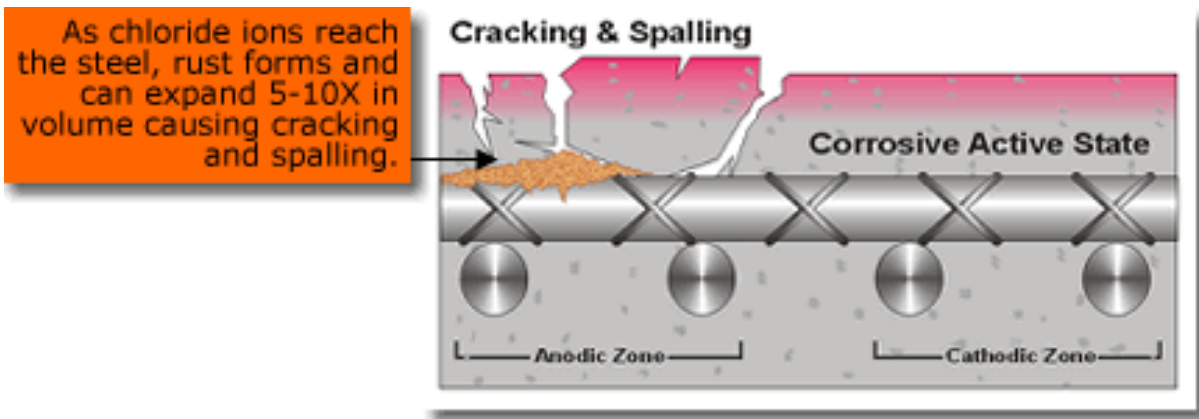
Cracking and spalling of concrete due to penetration of chloride ions
